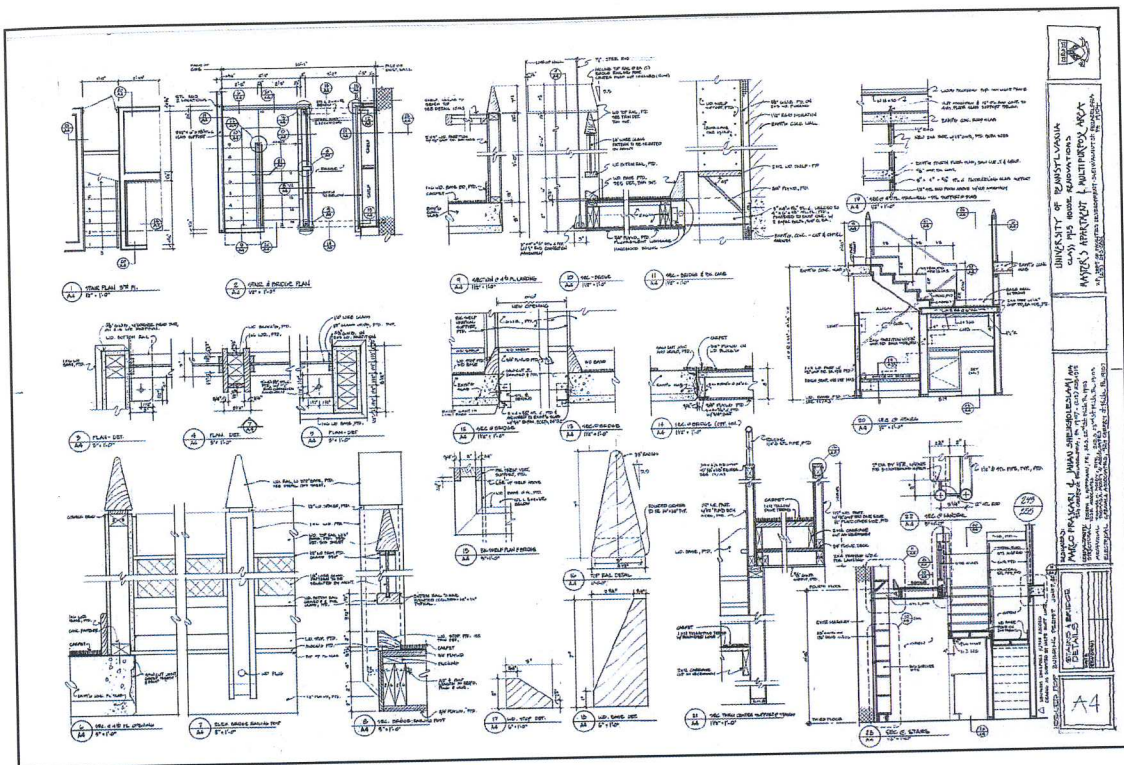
Master's Apartment in the House of 1925, Working Drawing of Stair, Handrail and Balustrade
